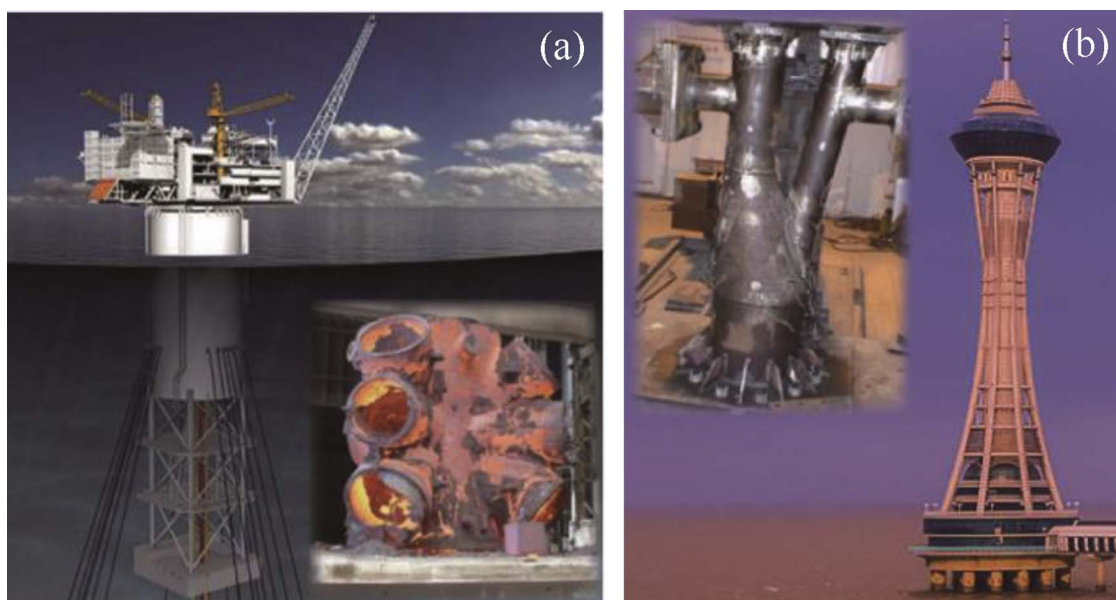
Cast steel joints used in real projects. (a) Aasta Hansteen FPSO spar, and (b) Hangzhou Bay Sightseeing Tower.
